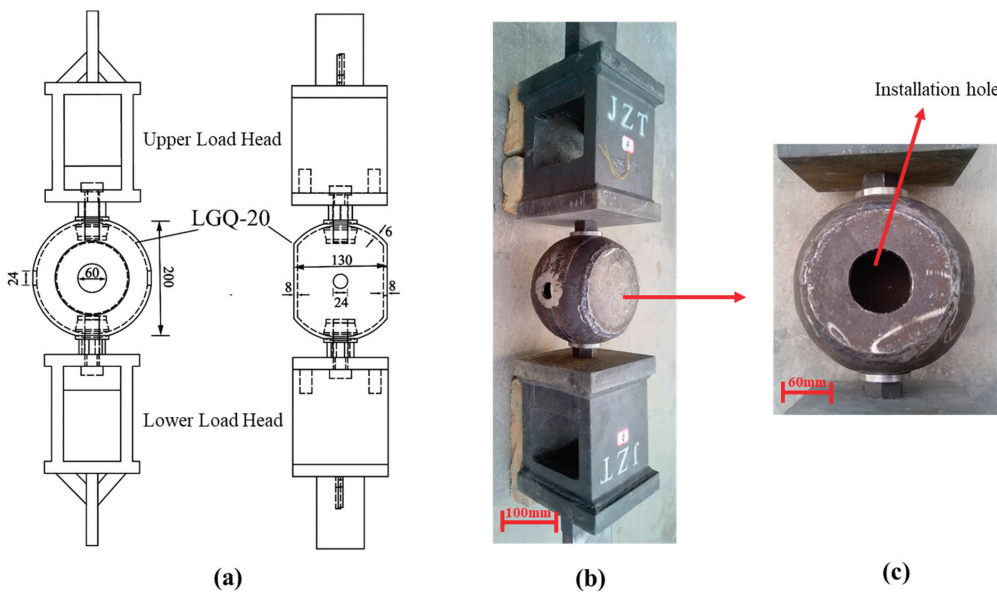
Schematic diagram of specimens: (a) dimensions and details of specimens (unit: mm), (b) picture of specimens, (c) installation hole.
